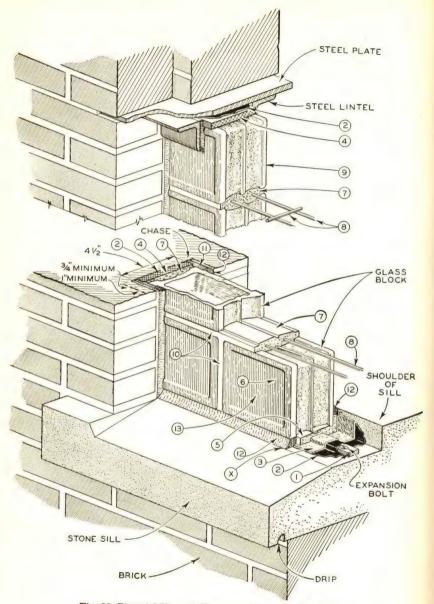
Pictorial View of Glass Block Panel in Brick Wall
